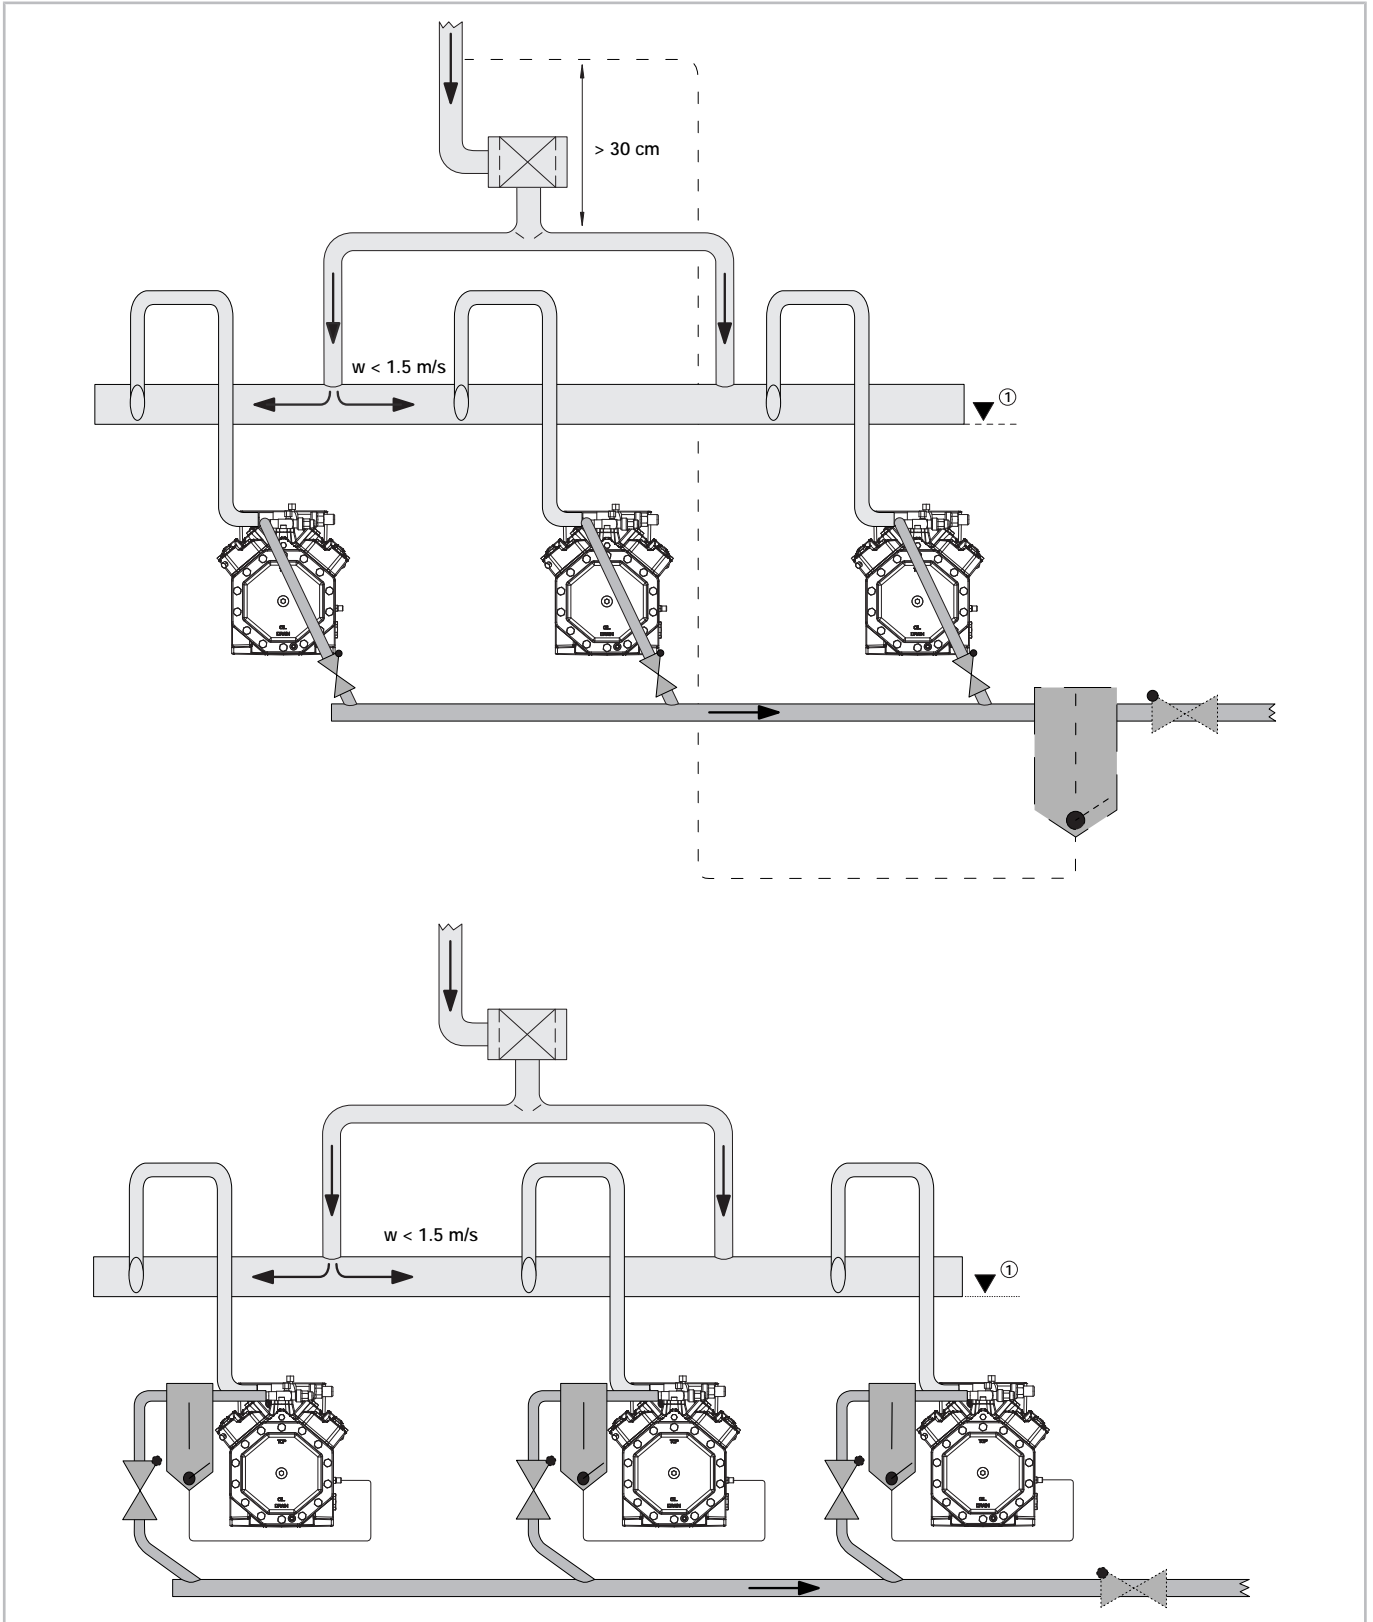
Parallel compounding reciprocating compressor: Design of the pressure header
